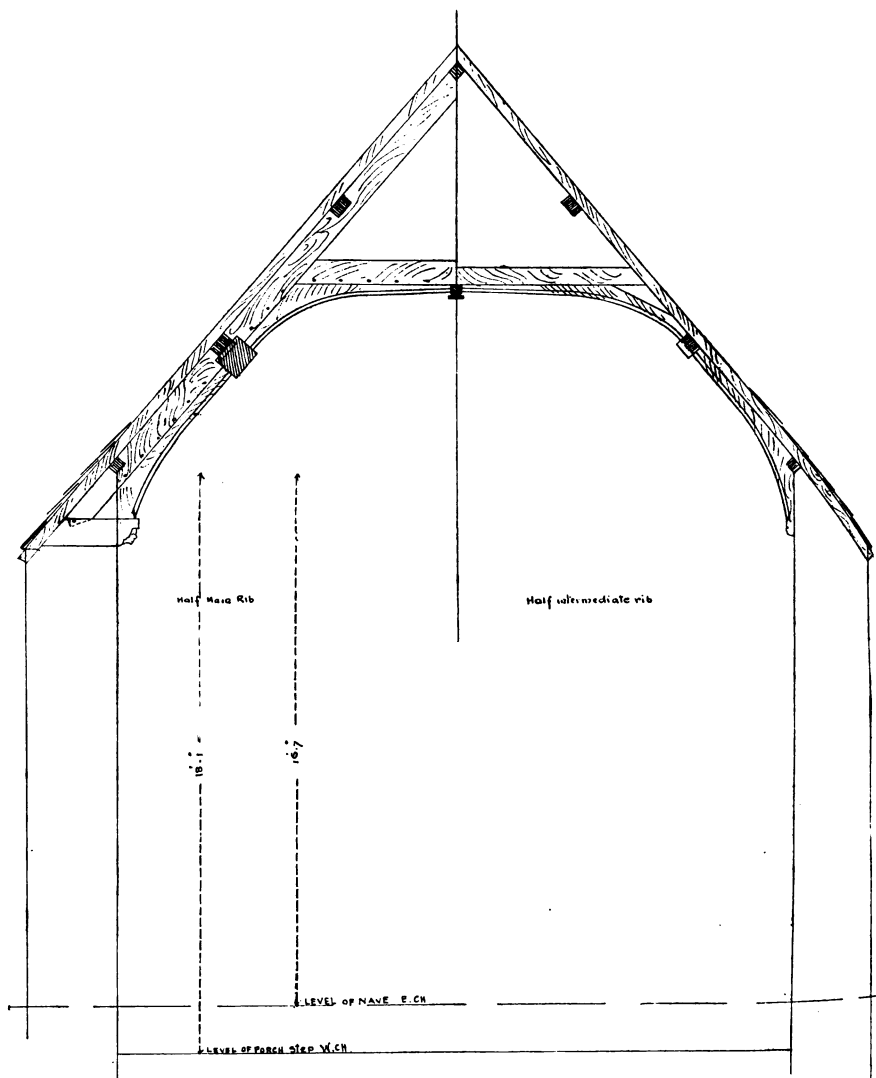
Western Church at Llantwit Major: Cross-section, showing roof.
